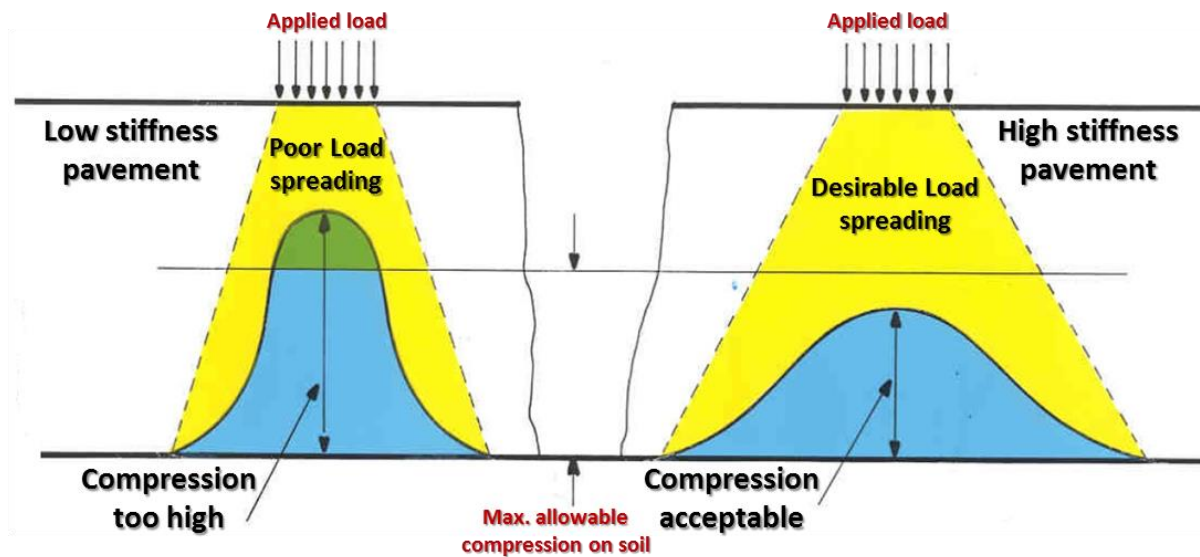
Load spreading in flexible pavement (Rahman 2004)
